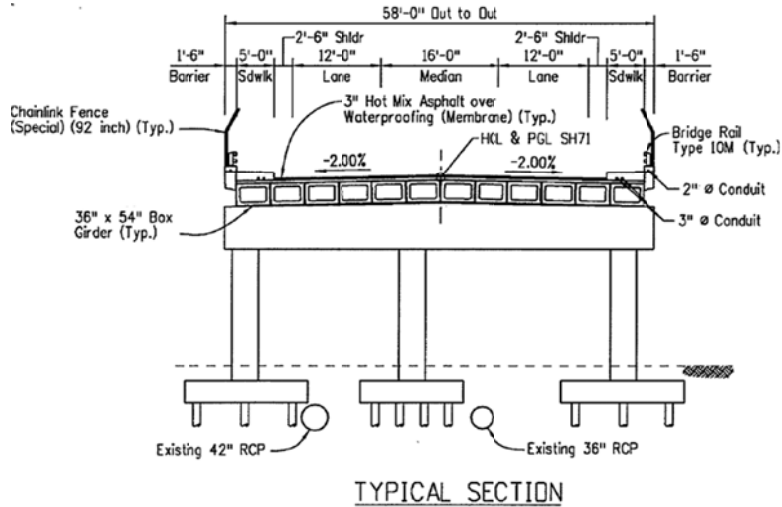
Substructure is asymmetric due to existing reinforced concrete pipes. Drawings courtesy of CDOT [50].
